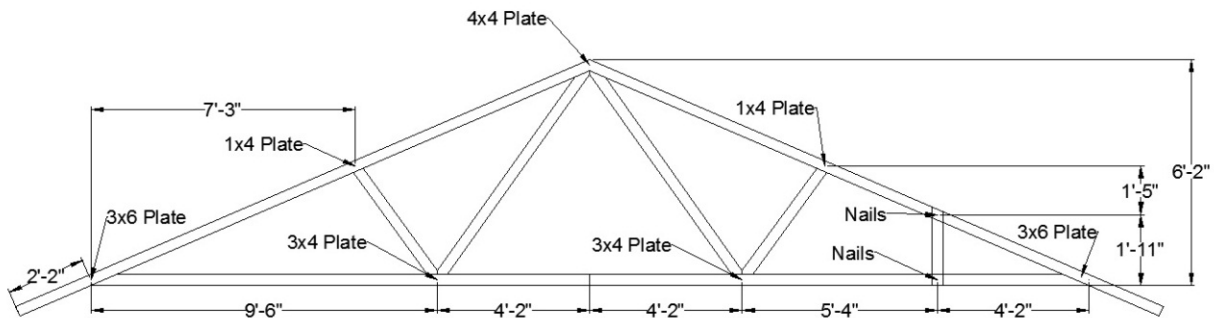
, Geometry of roof trusses at 808 S. Silver Leaf.
